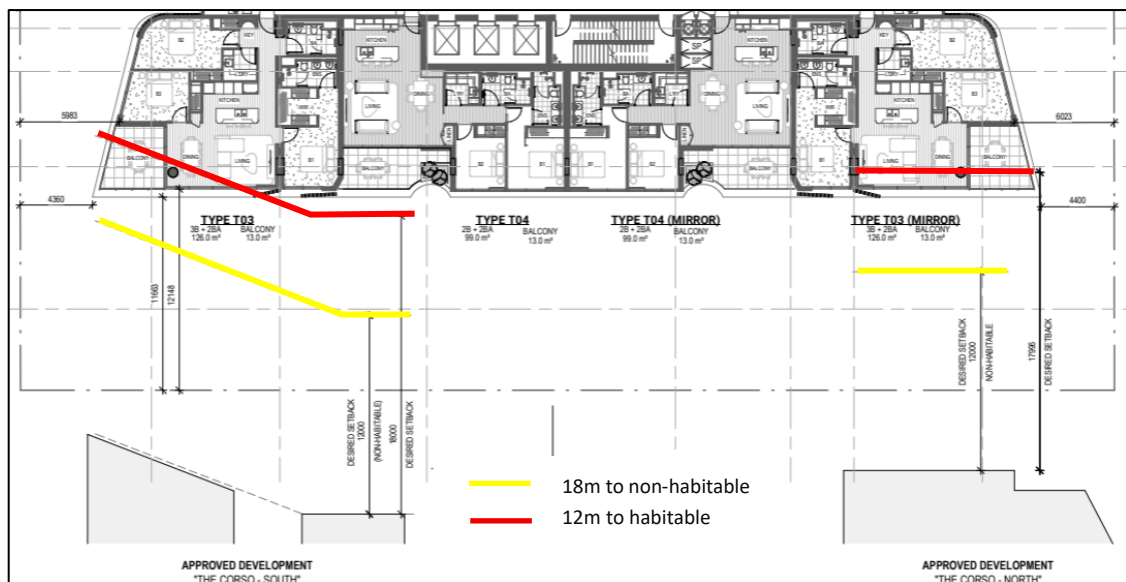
Levels 5-14 Encroachment into Tower Separation Setbacks (Source: Plus Studio 2026)
